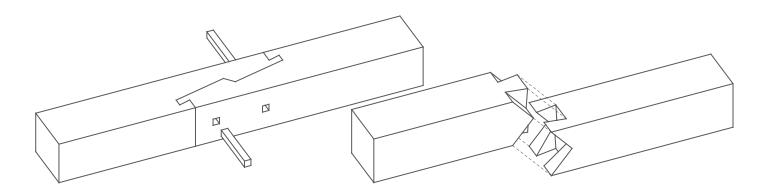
Examples of traditional Japanese joinery, own illustration
